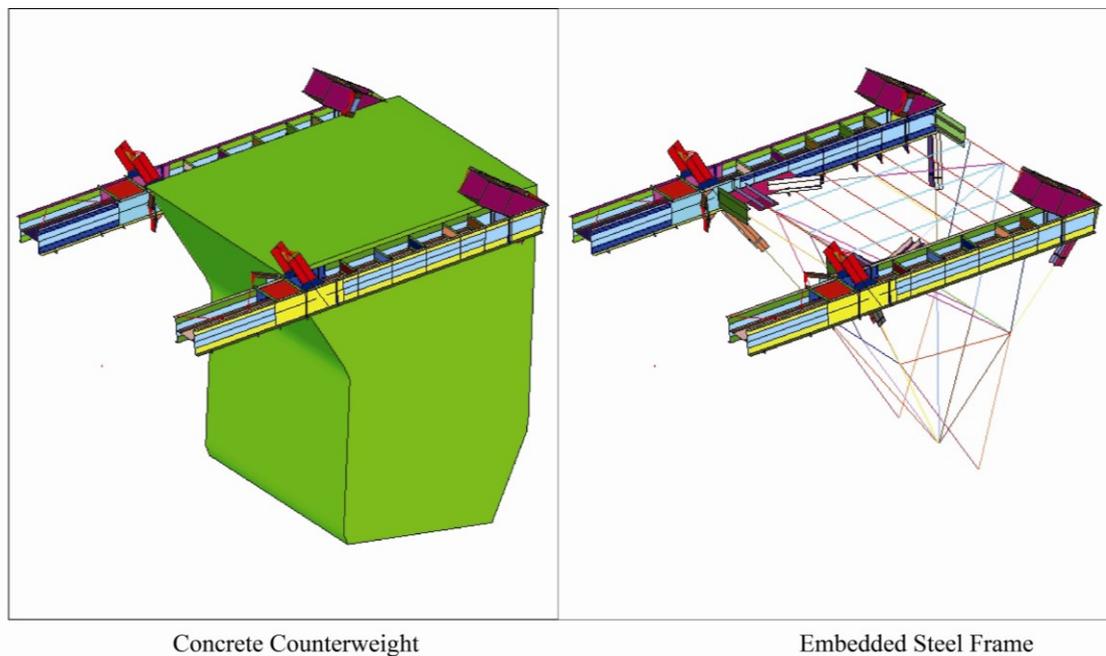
Illustrative Mesh of Concrete Counterweight and Embedded Steel Frame
